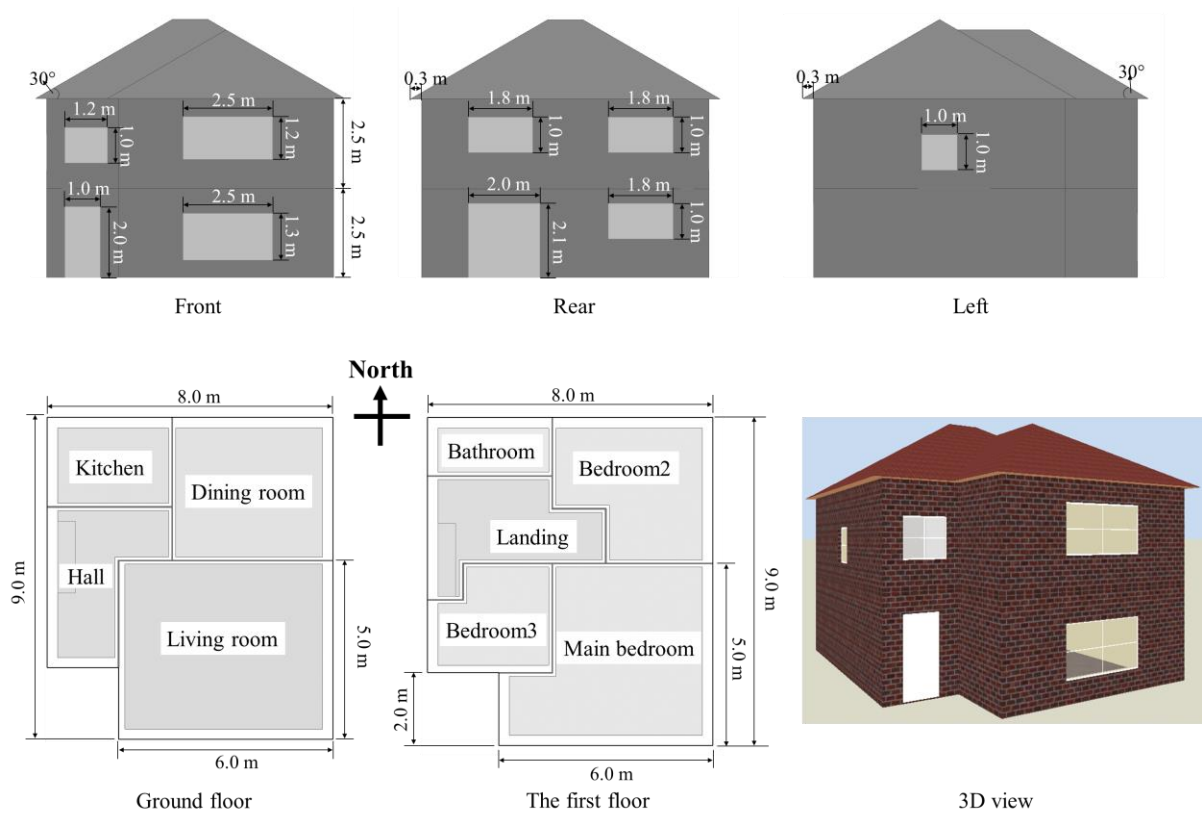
Geometry, floor plan and glazing dimensions of the detached house
